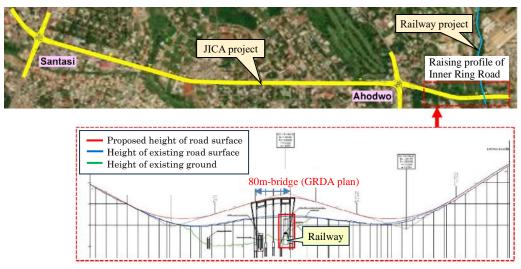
Study on Milder-slope Road Profile at the Road Section around Ahodwo Intersection
